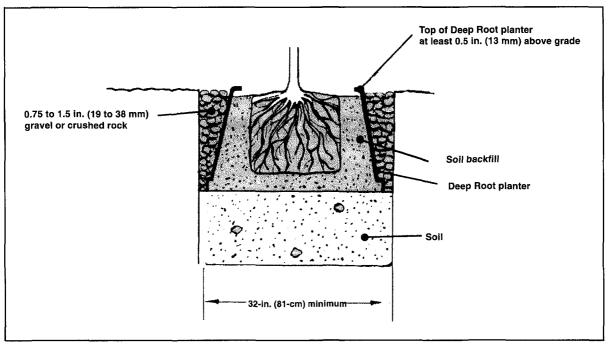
Planting specifications for Deep Root surround planter (RP 22-30-18).
